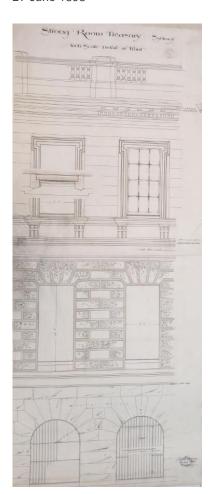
Strong Room Treasury: Detail of stone façade similar to as constructed
